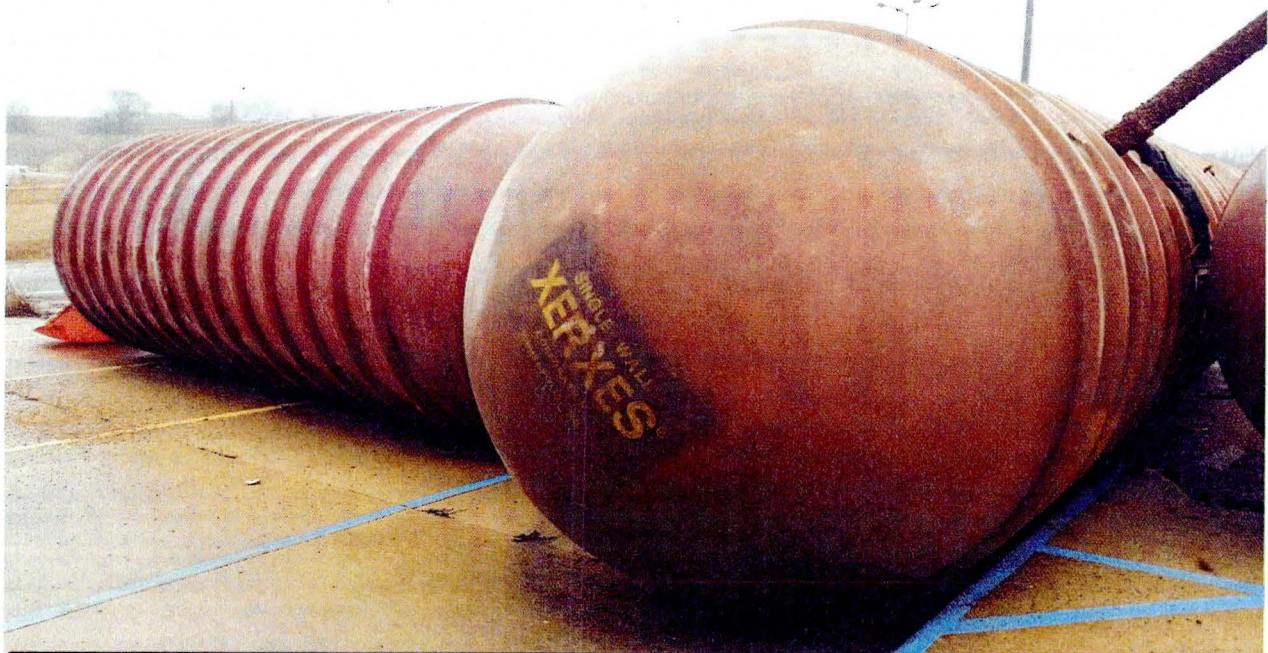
PHOTOGRAPH OF ONE (1) 8,000-GALLON FIBERGLASS UNDERGROUND STORAGE TANK
